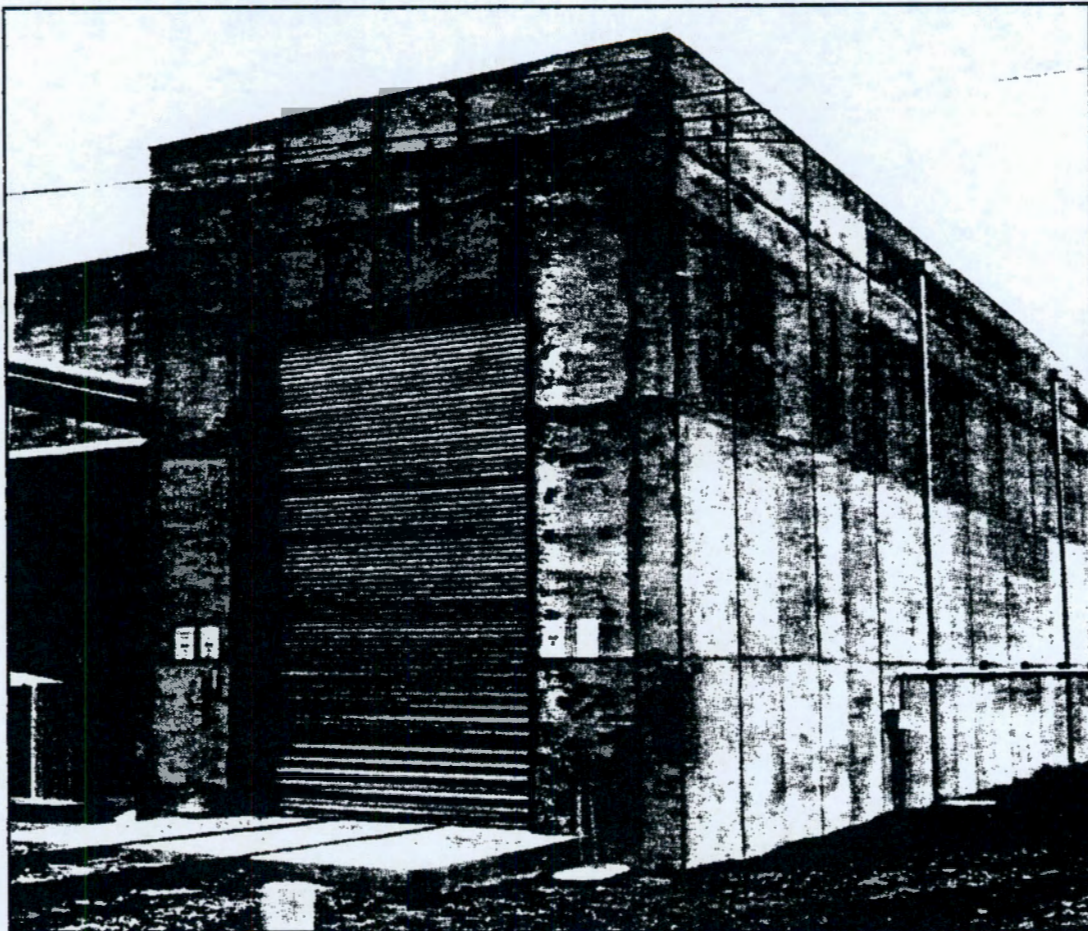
The New 204-AR Tank Car Unloading Building. This modern concrete structure replaces the outdoor facilities at 204-S.
